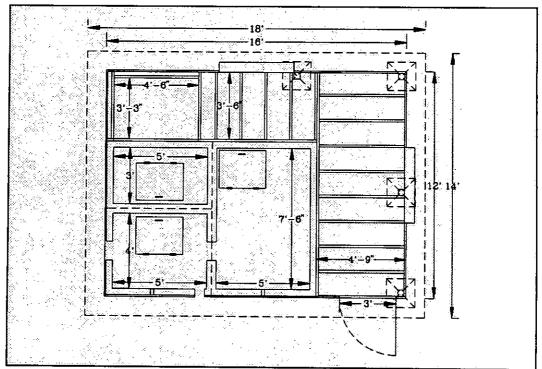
Greywater facility floor and structural plan. Grosskopf, Kevin R. University of Florida, 1994.
